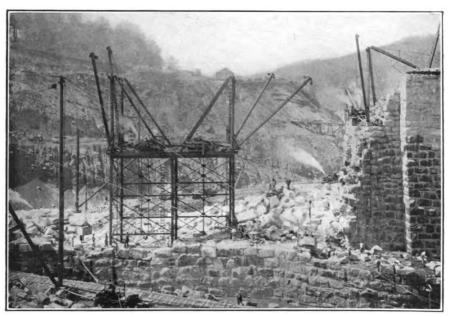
Fig. C.—New Croton dam. Steel towers on which derricks were mounted.
